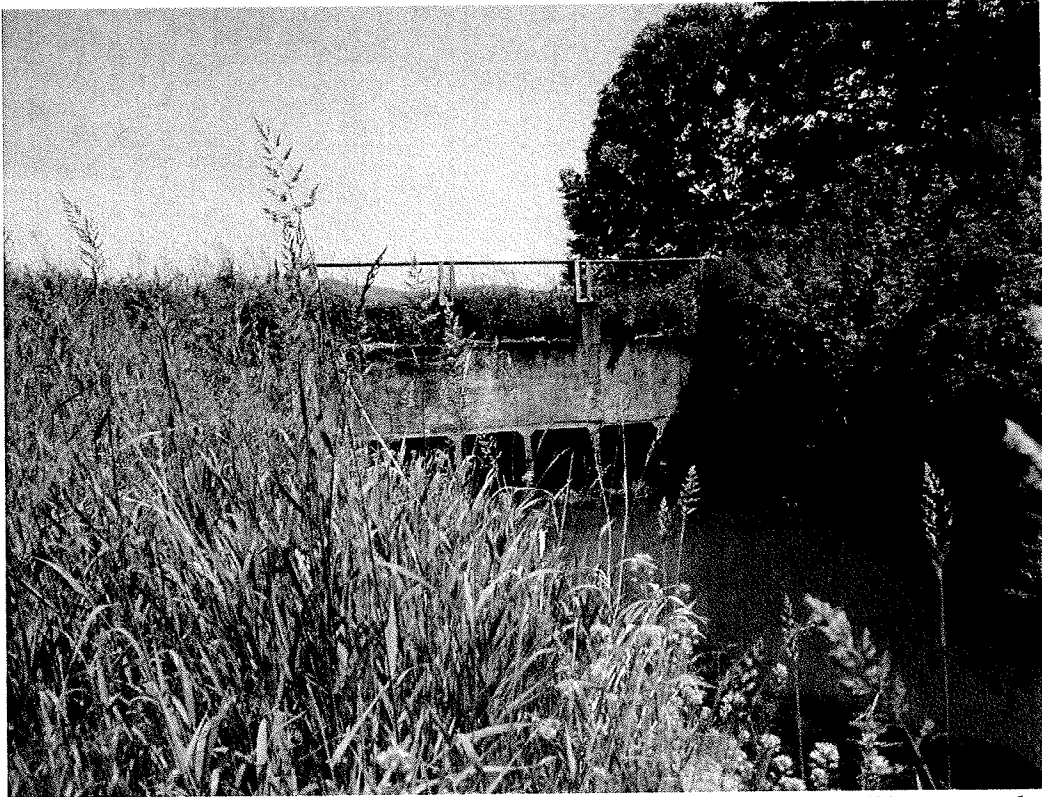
, Facing NE towards the "Big Ditch Culvert Crossing" which will be removed
